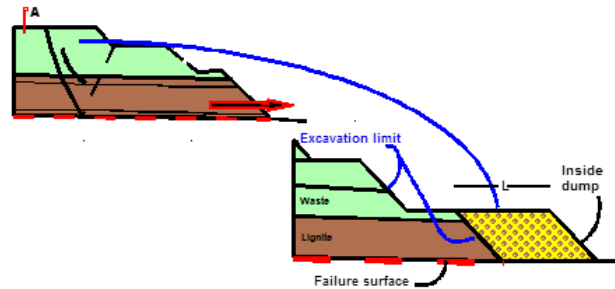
Failure unloading and constructing a stabilizing berm at the slope toe with the material from unloading
